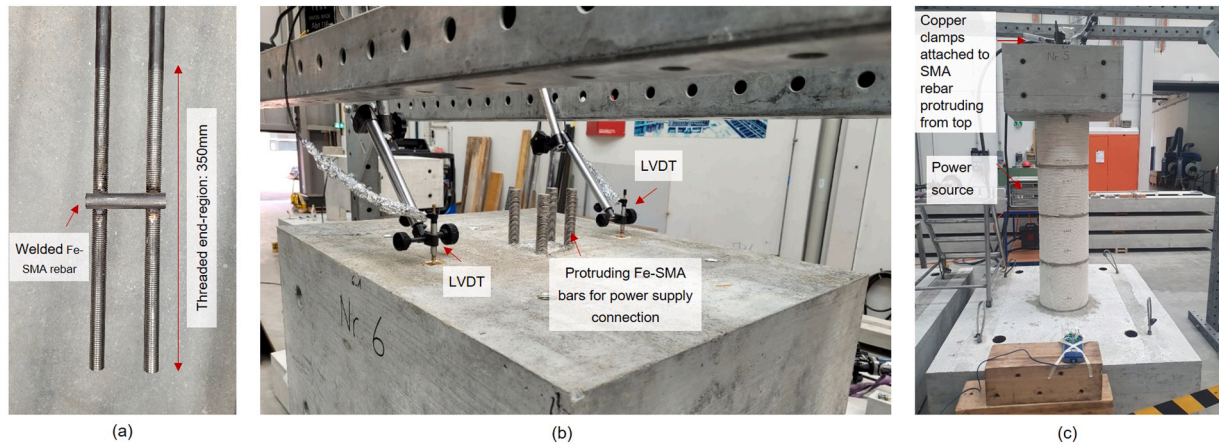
Setup for Fe-SMA activation by electrical resistance heating: (a) rebar pair joint within column footing for electrical continuity; (b) protruding Fe-SMA rebars acting as electrical connection points and axial displacement measurement instrumentation; (c) overall activation setup.
